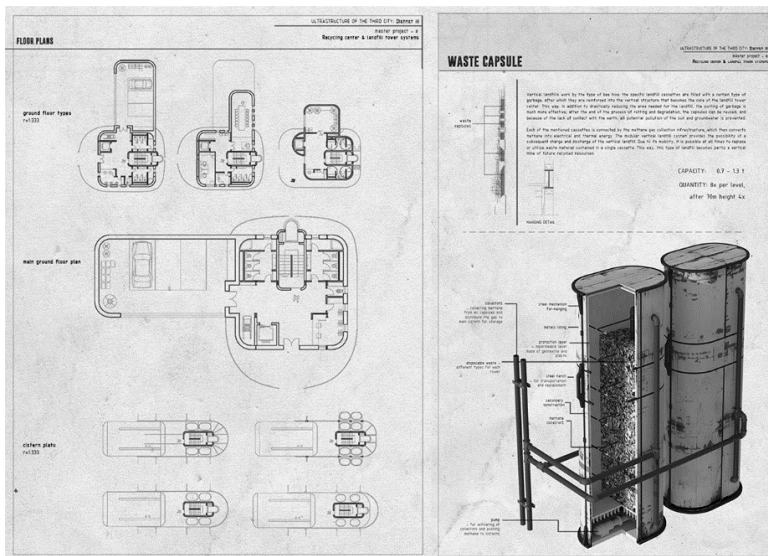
Floor Plans and Waste Capsule Axonometric View
